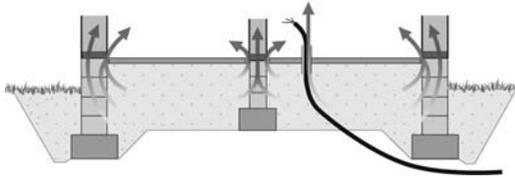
Entry routes of soil air in a Finnish slab-on-ground foundation. The foundation wall is constructed of permeable light-weight concrete blocks.
